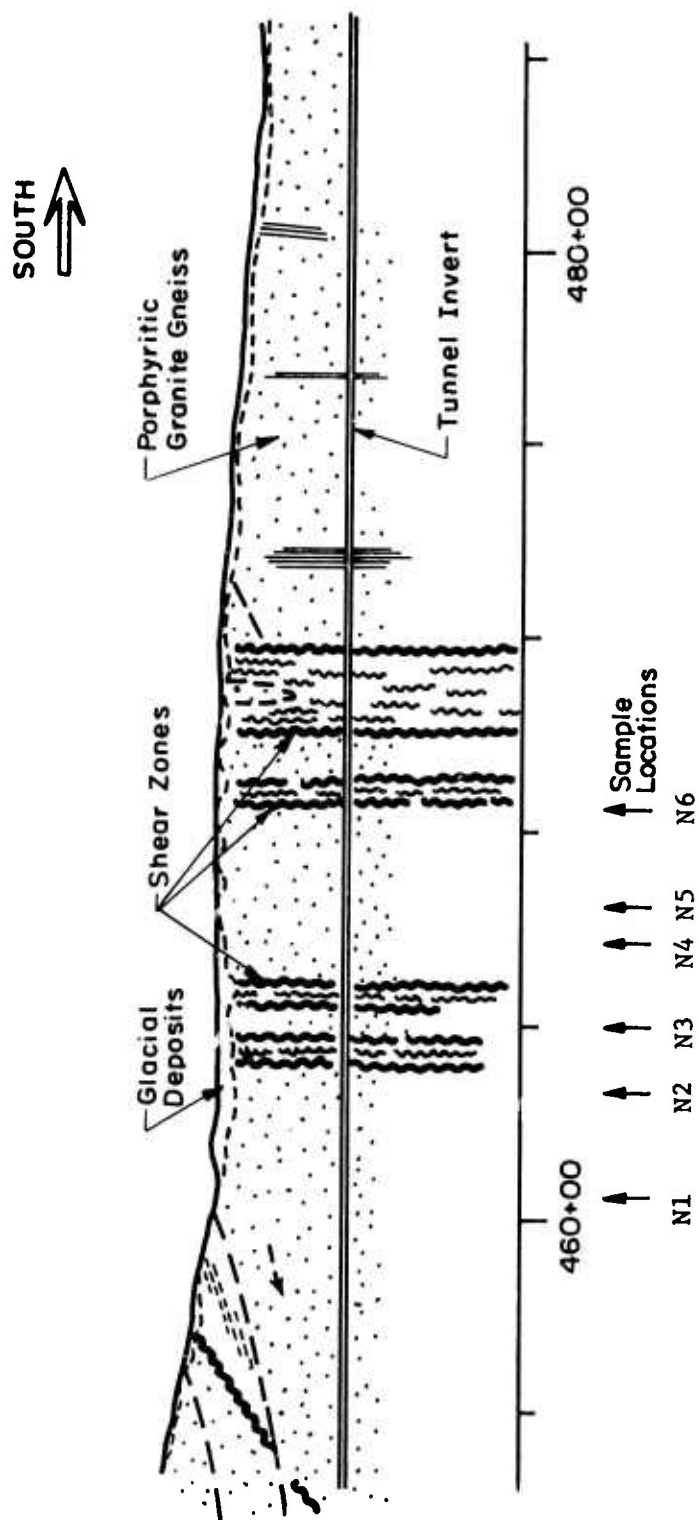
CROSS-SECTION OF NAST TUNNEL SHOWING SAMPLE LOCATIONS
